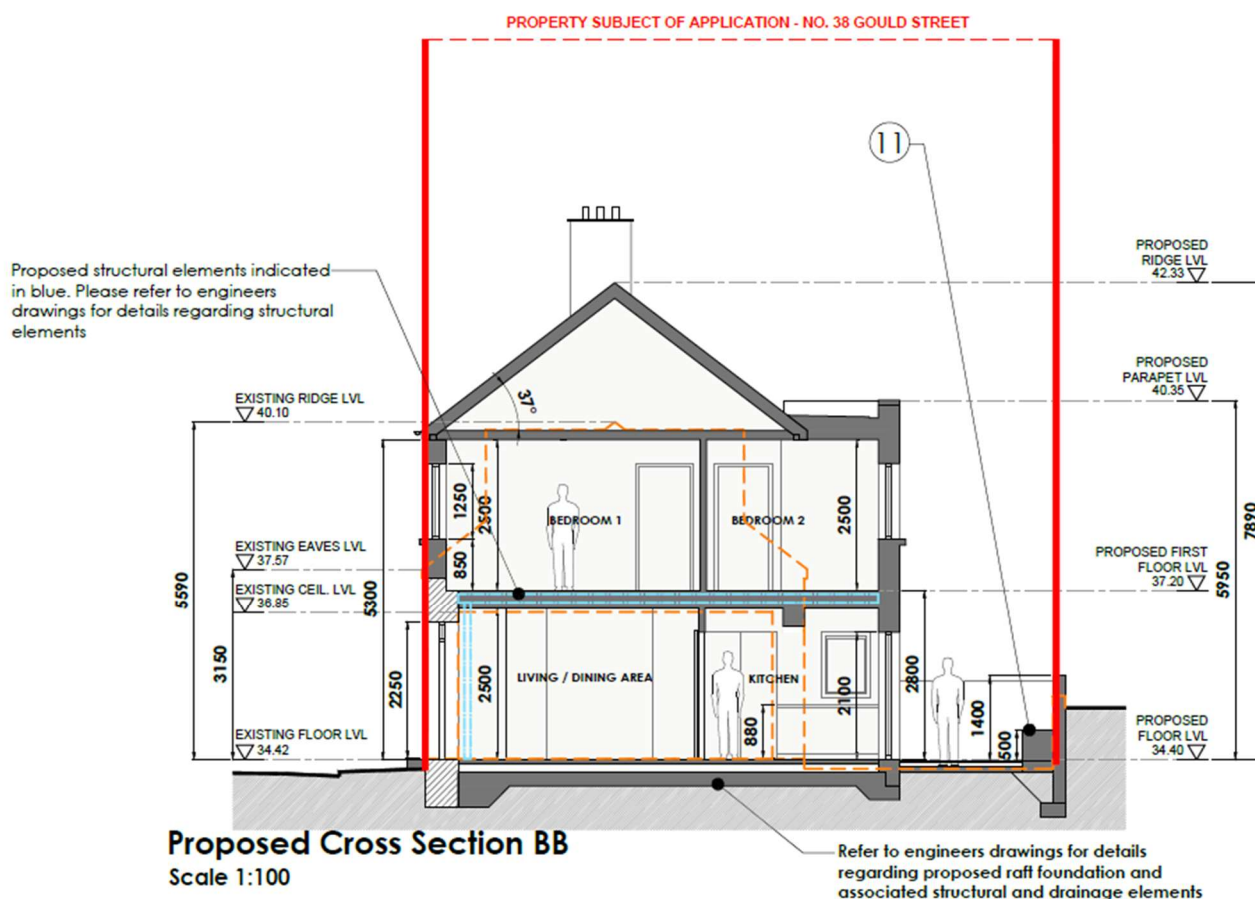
Proposed cross section demonstrating the retention of the existing façade, with proposed extensions.
